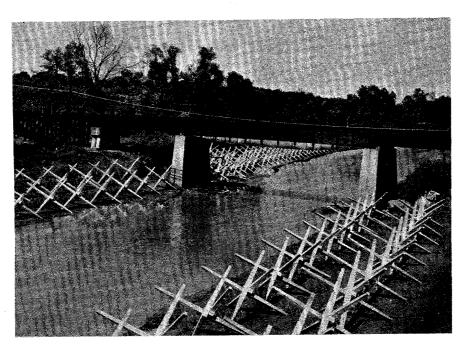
Concrete jacks used as retards, photographed soon after installation in 1970. (Tallahatchie River at New Albany, Miss.; U.S. Dept. of Agriculture, Soil Conservation Service.)
